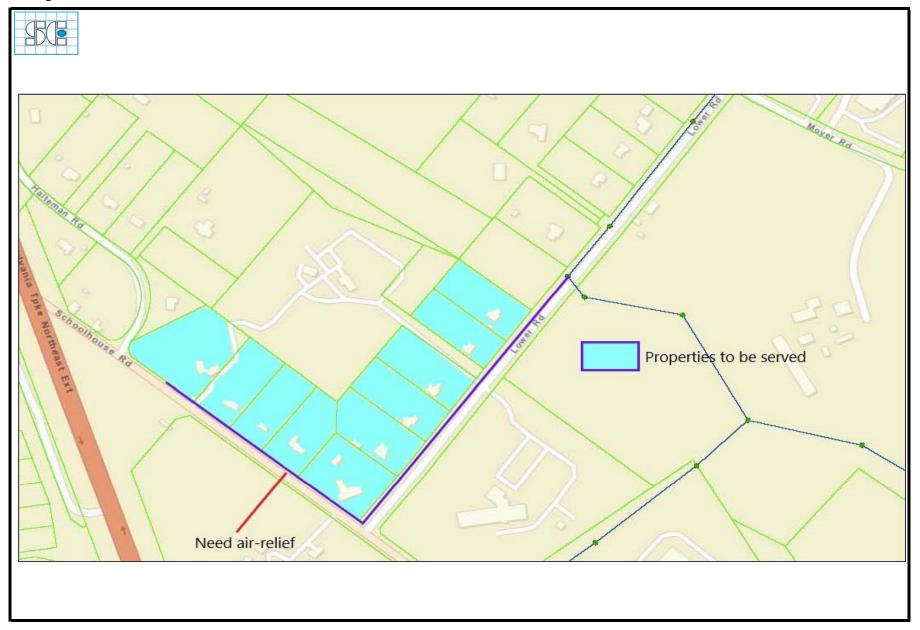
SEWER EXTENSION IN LOWER AND SCHOOLHOUSE ROADS
